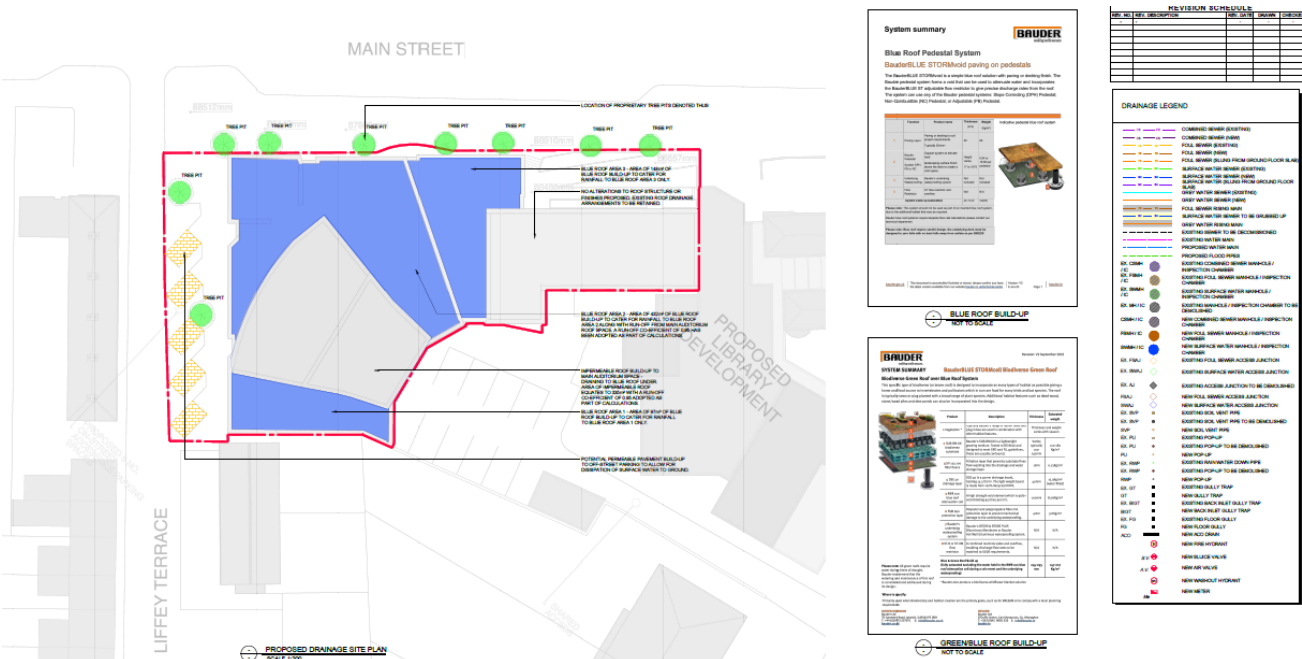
Drainage - SuDS Layout ~General Arrangement (Source Cora Consulting Engineers)
